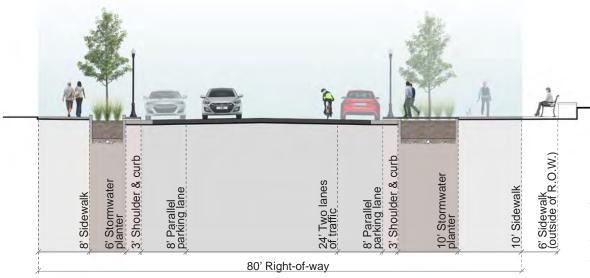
Typical section of what East Capitol Avenue could look like with stormwater planters, bike lanes, and a wider sidewalk on the south side of the street.
